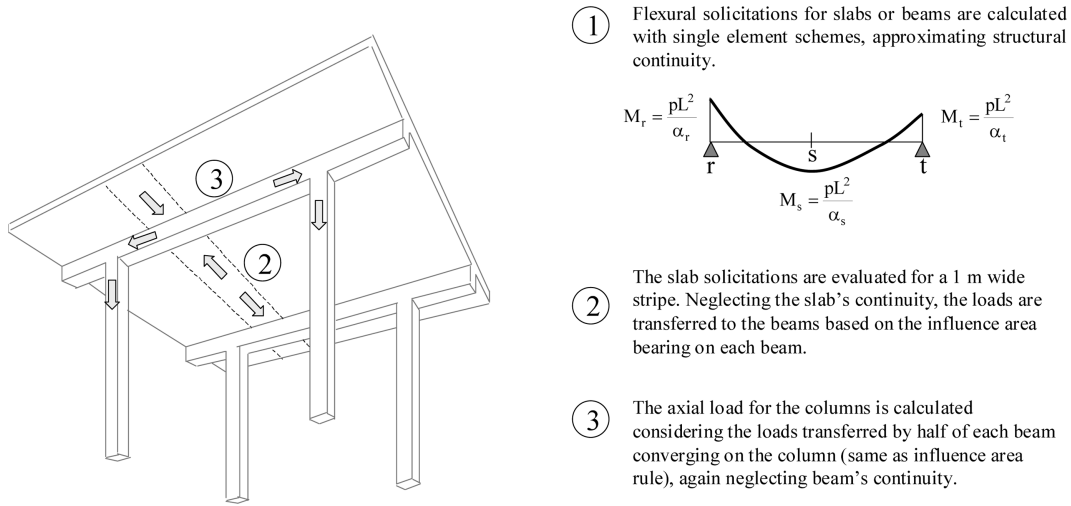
Simplified load transfer schematization for a gravity load designed reinforced concrete frame with unidirectional joist-slabs
